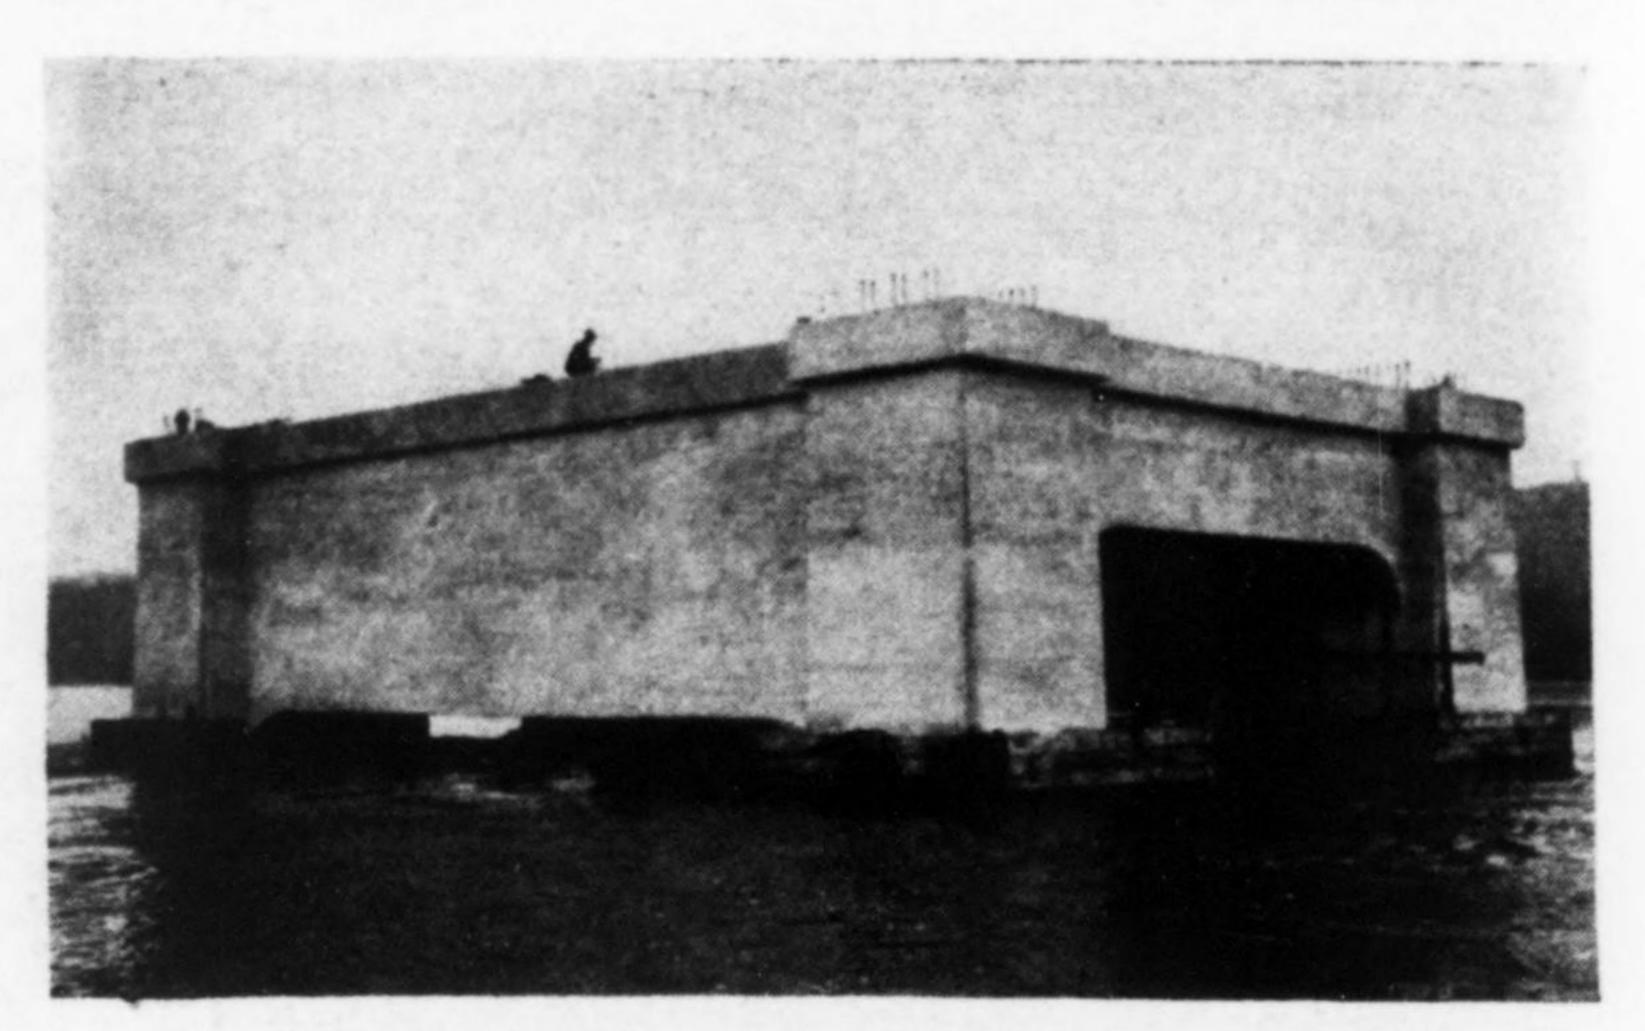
MAIN CHANNEL PIER COMPLETED, LONGVIEW BRIDGE
